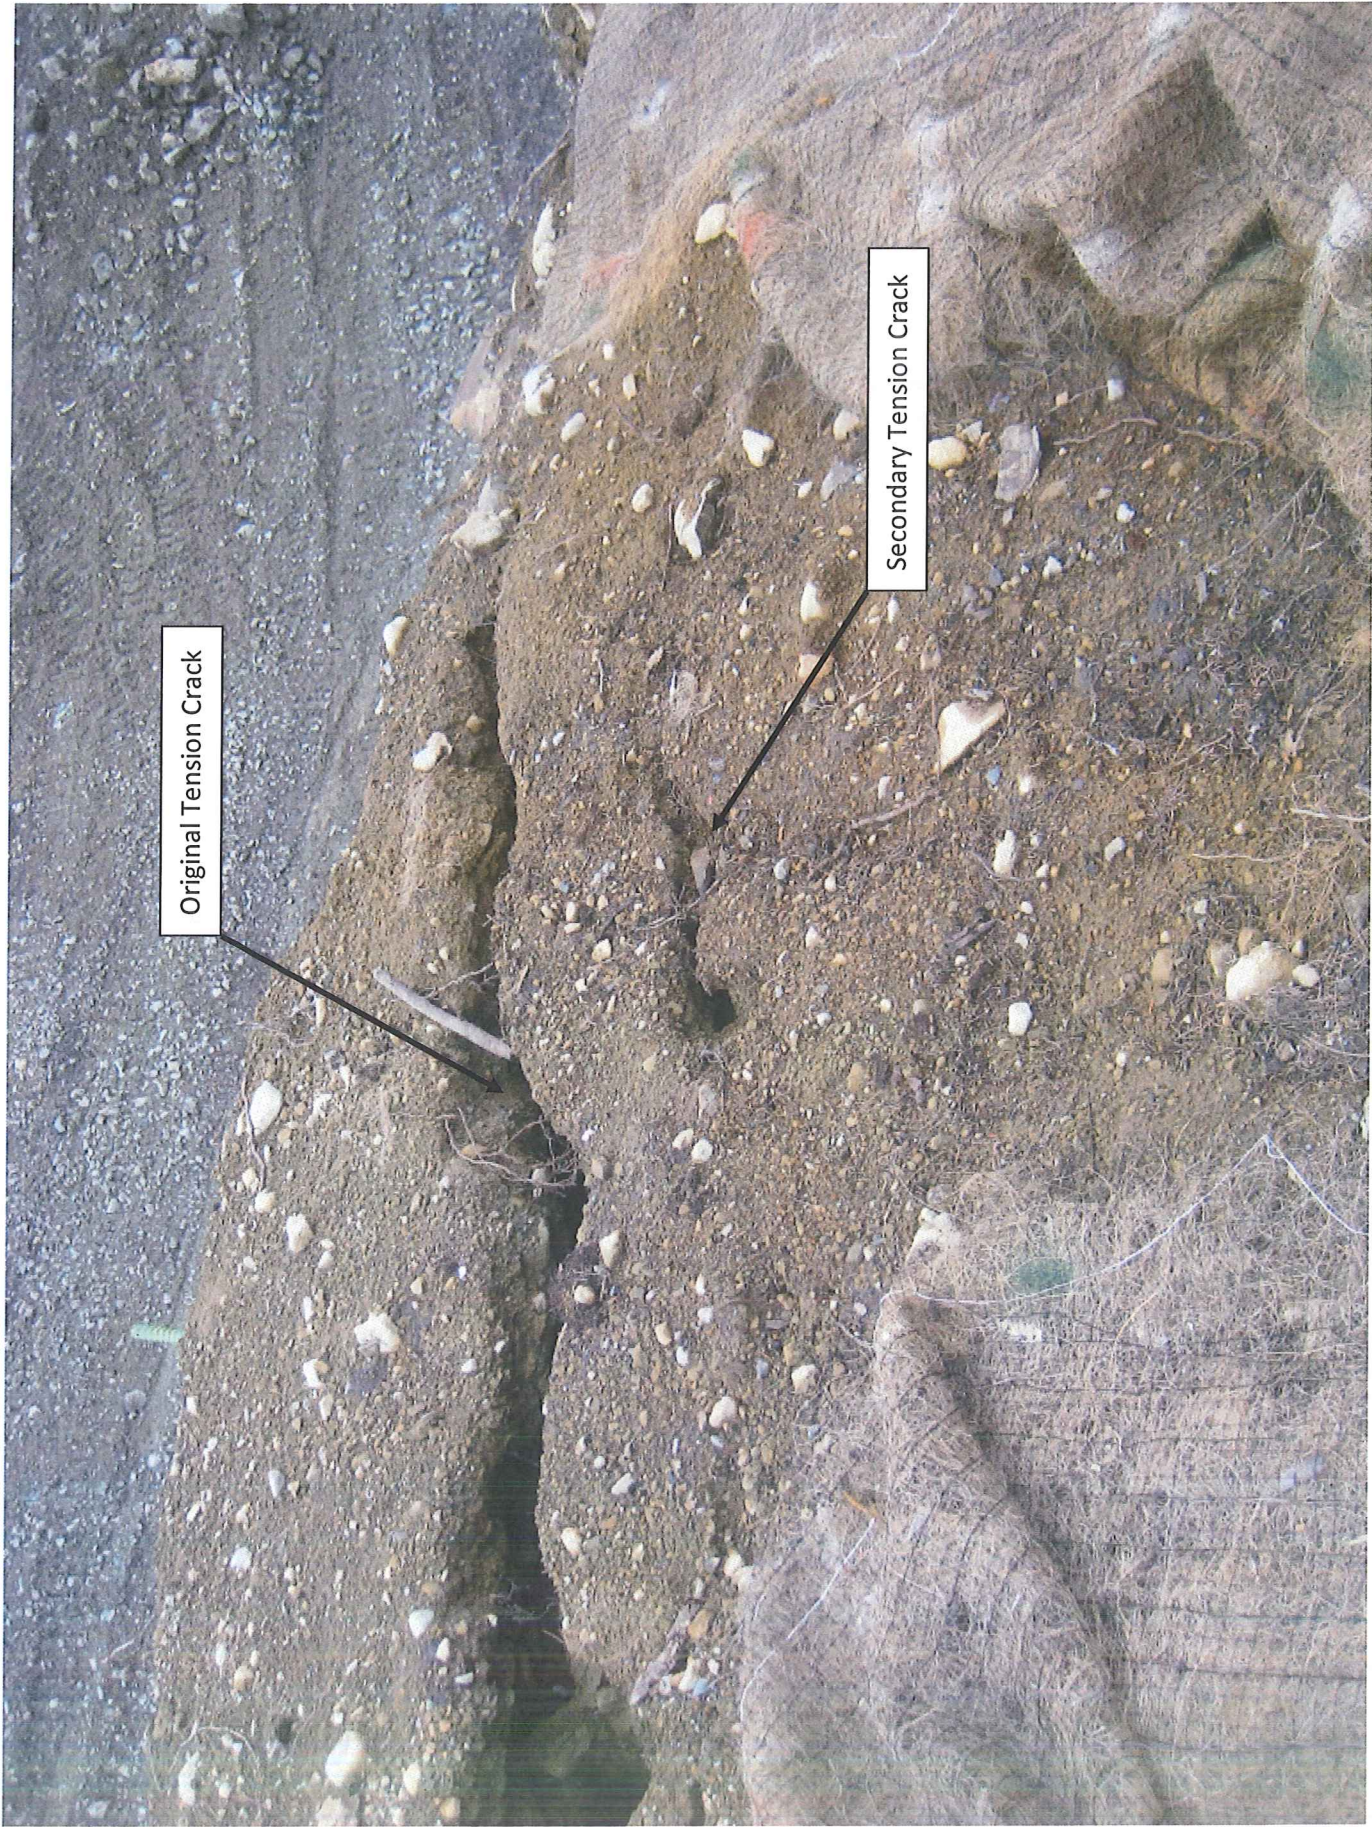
A photograph showing the tension cracks upslope at approximate station 1325+00. Note that a second tension crack is beginning to develop.
